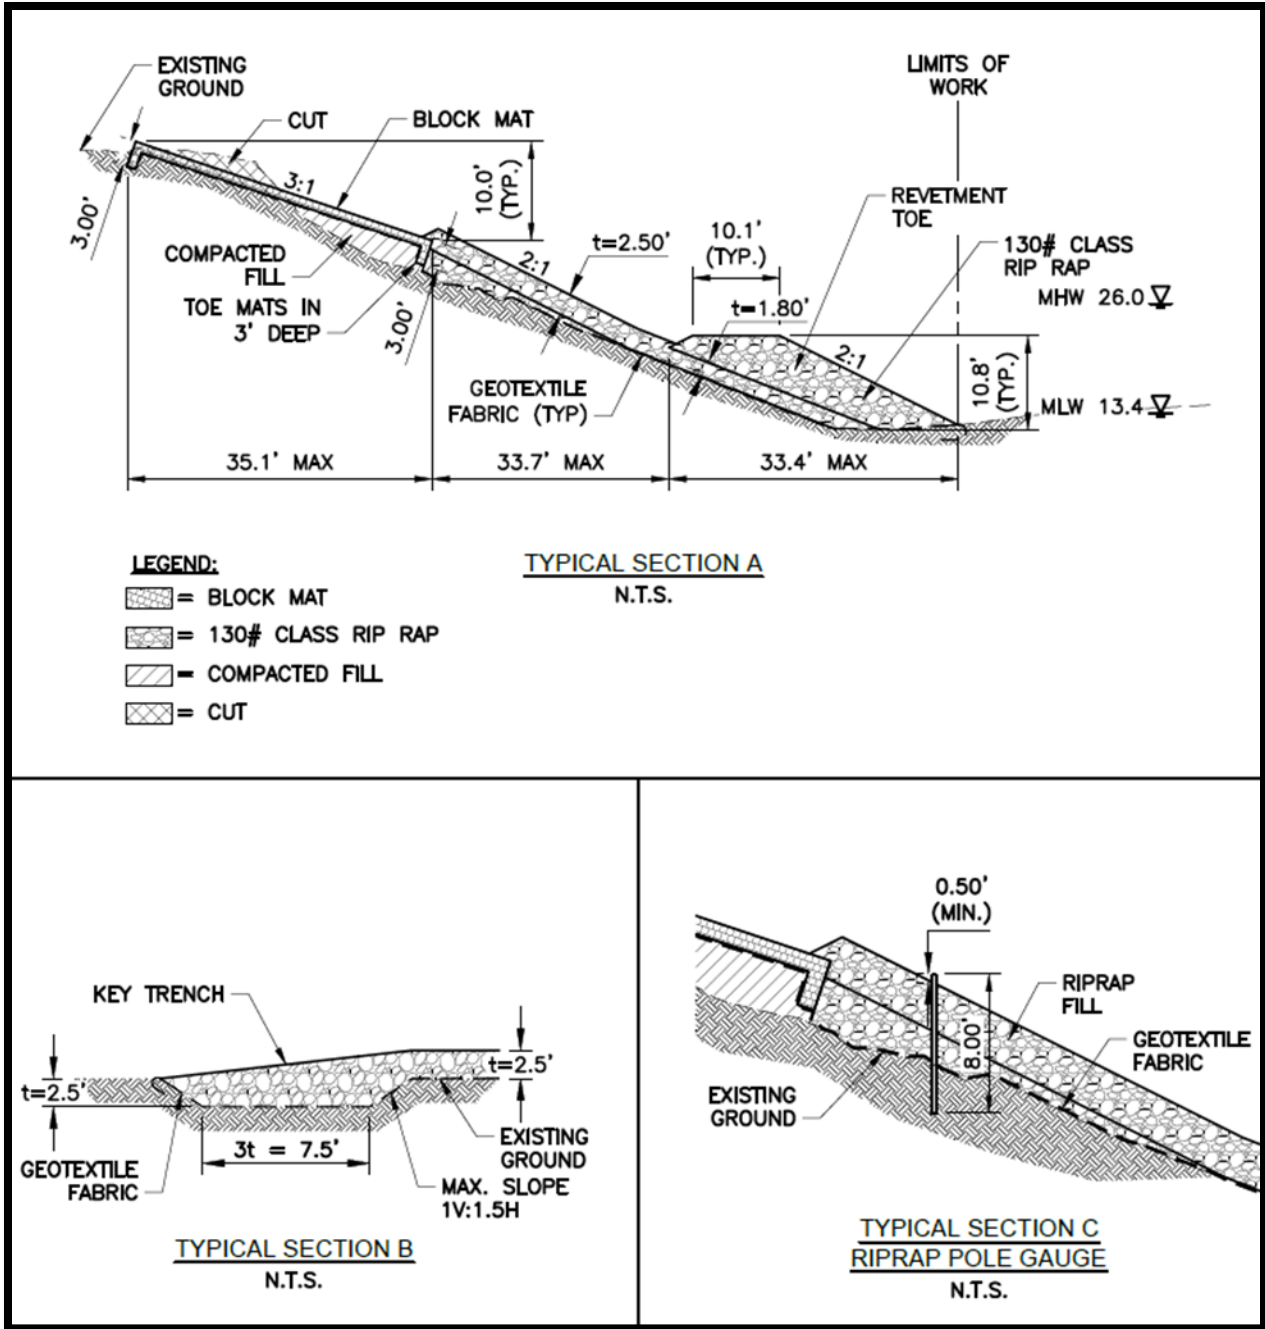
Revetment Design Details for Bayou Sara Streambank Stabilization
